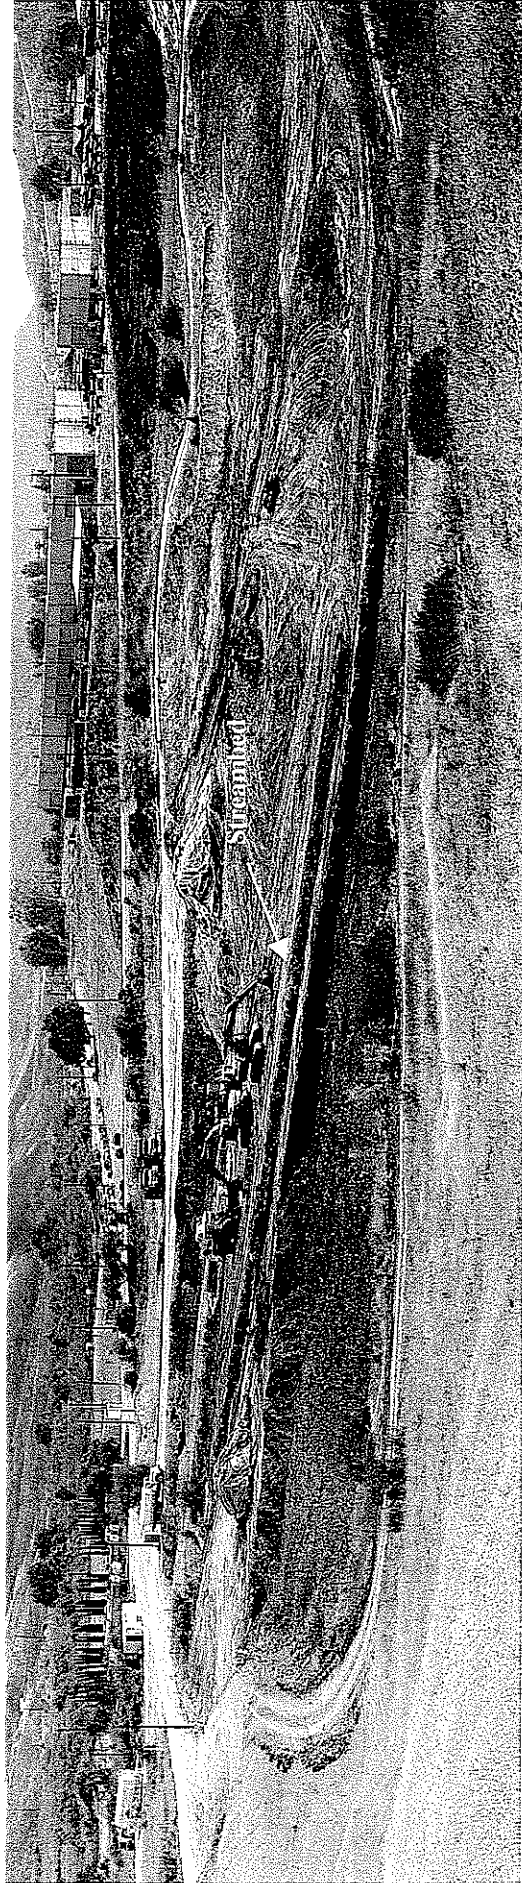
Site 1F Excavating and Stockpiling Activities Western Area (July 7, 1999)
